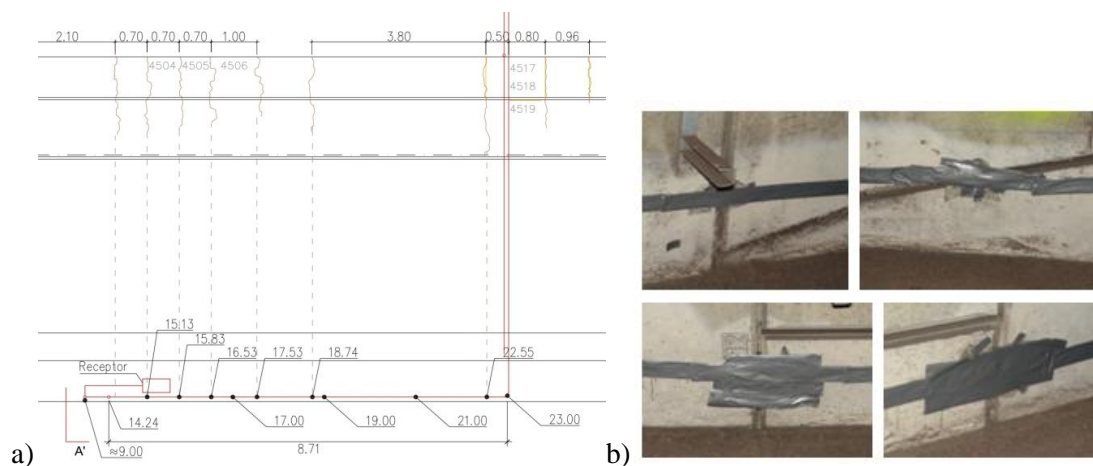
14-26m segment setup with a) detail of tunnel plan view and b) site pictures of discontinuities
